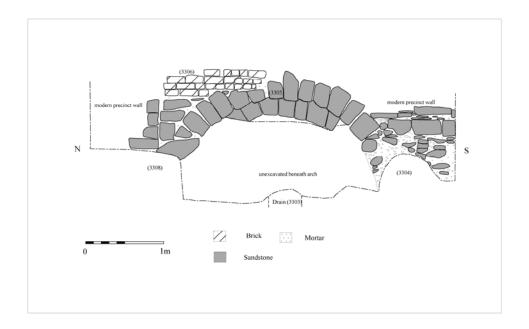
Trench 33: drawing of the west elevation of the arch of the main drain in the east precinct wall.
